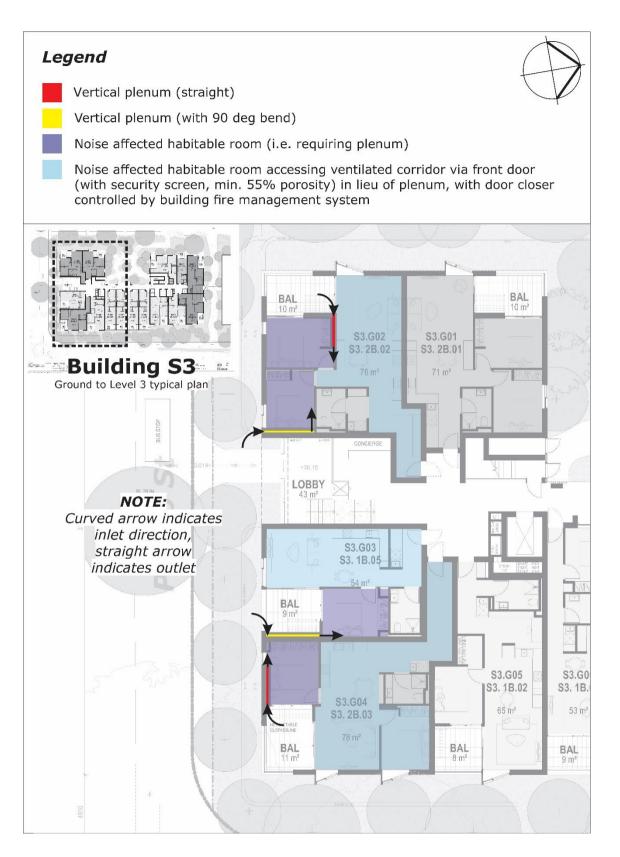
Plenums for the Ground Floor to Level 3 of Building S3
